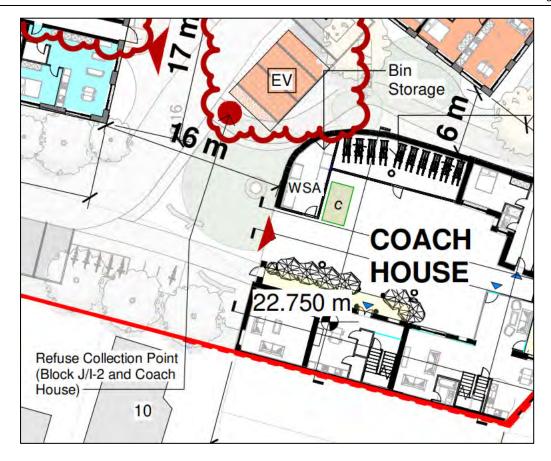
Refuse Collection Point for Block J and I-2 and Coach House WSA
